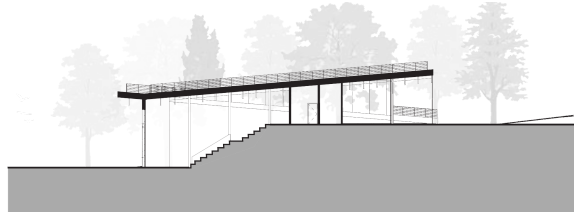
“Celebrate” Building West Elevation, (source: Author’s work)
